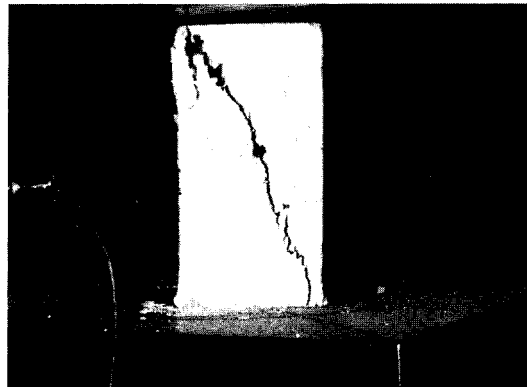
Crack pattern of the parallelepipedal specimen loaded up to failure
